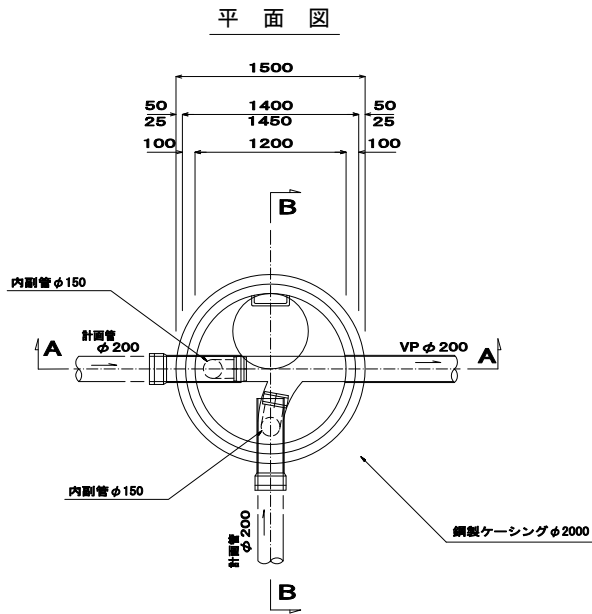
is a technical drawing of a drainage system, showing a cross-section of a wall and floor assembly. The drawing includes the following dimensions and components:
